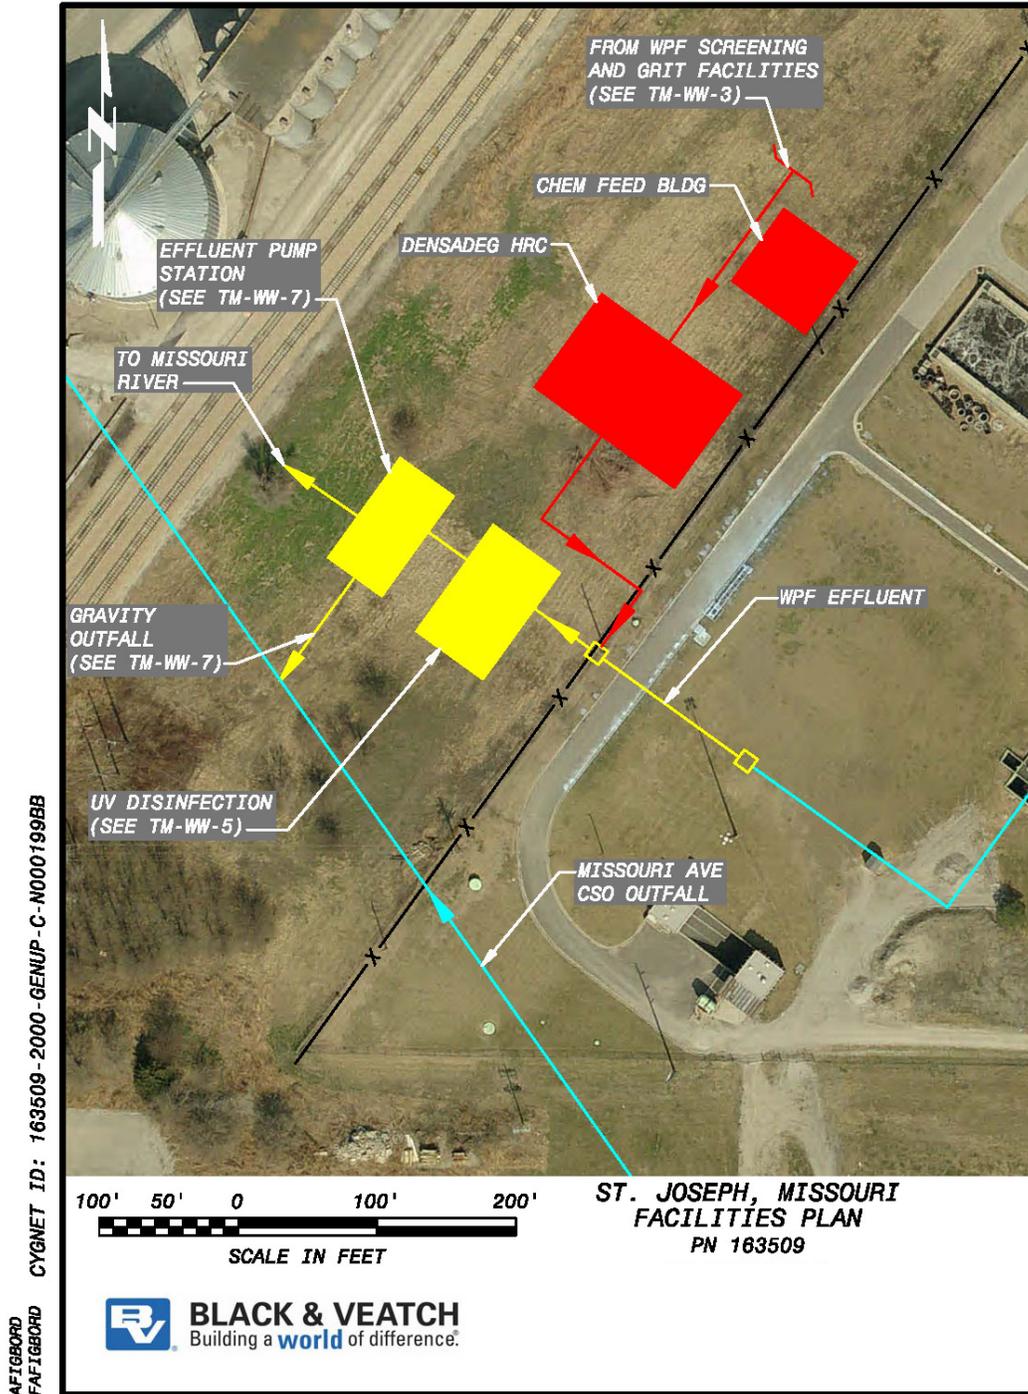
Preliminary Site Layout for Alternative 1B: Sludge Recirculation
